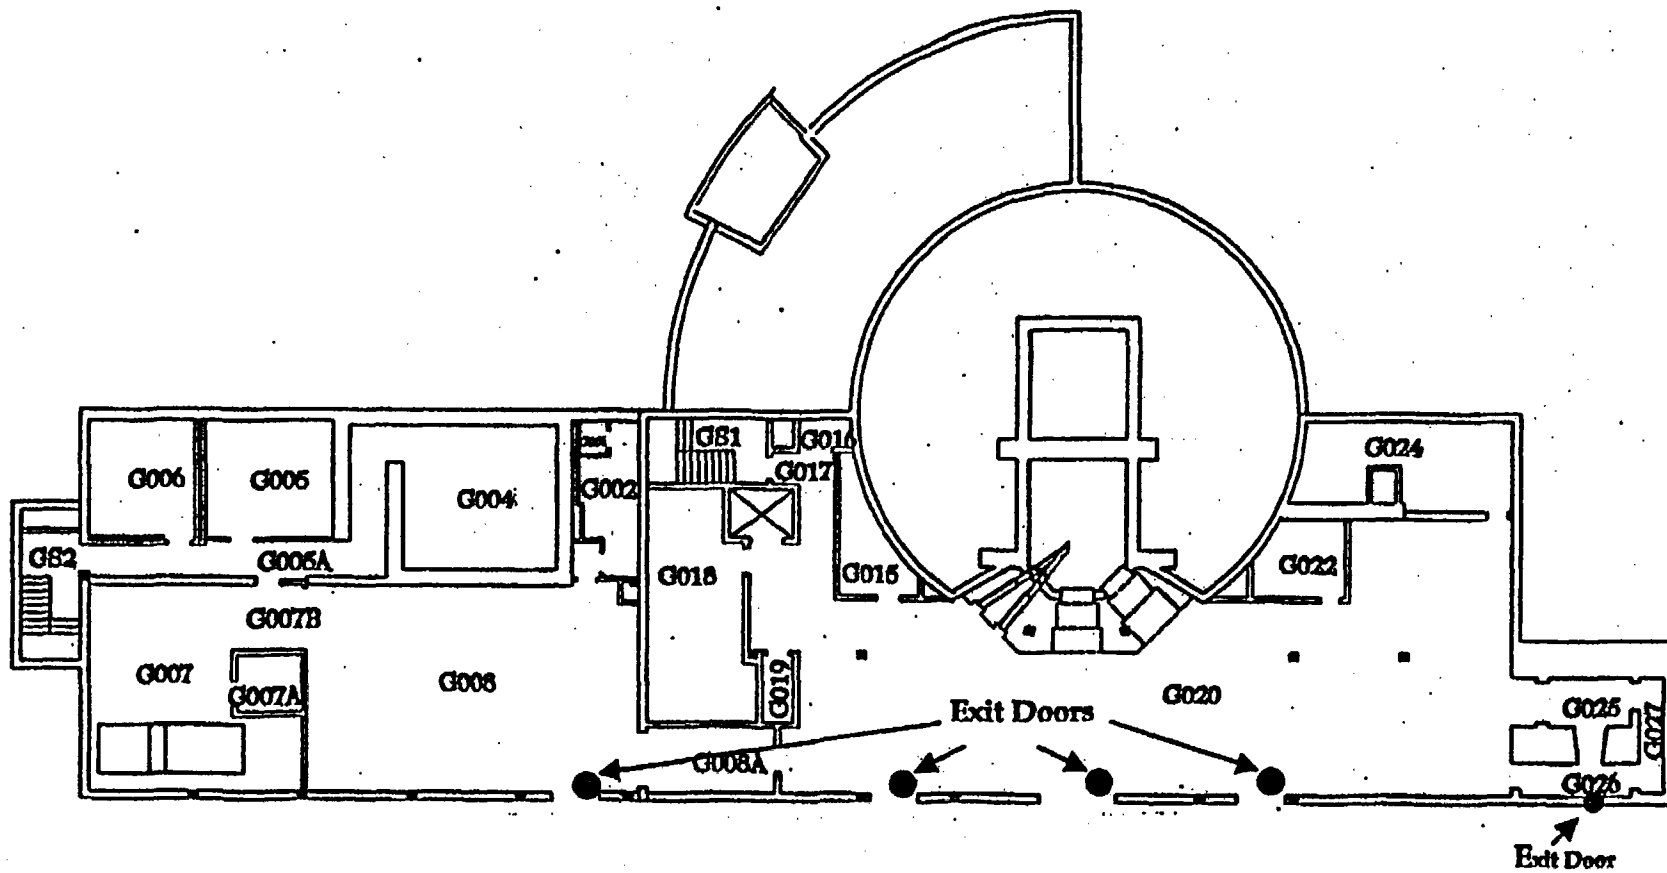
UVA Reactor Ground Floor Plan View Indicating Survey Locations on Exterior Building Surfaces.
